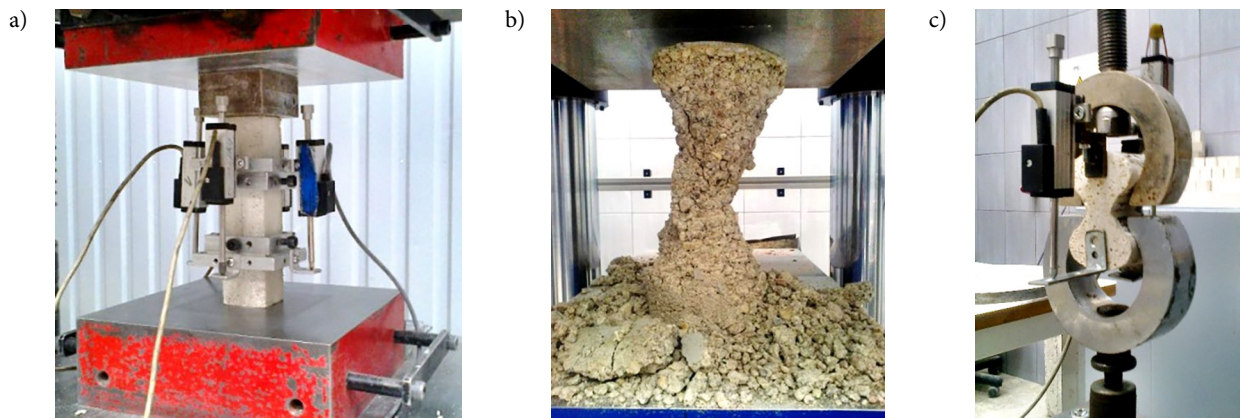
Material specimens during test: (a) – high strength concrete prism; (b) – concrete cylinder; (c) – briquette specimen at direct tension test
